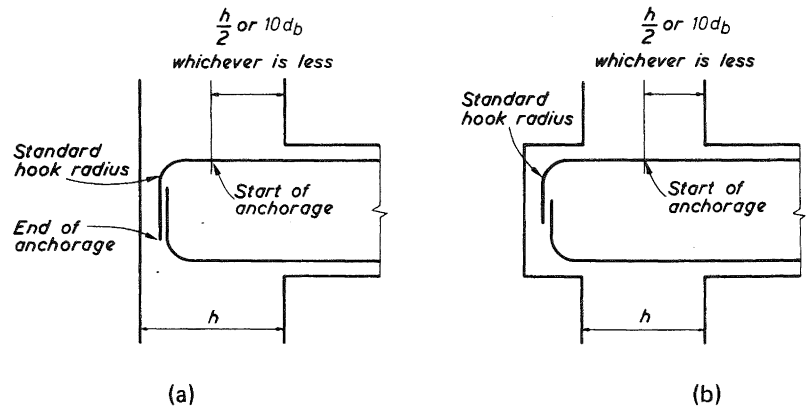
Anchorage of Beam Bars at Exterior Column When Plastic Hinge Can Form in Beam at Column Face: (a) Anchorage in Column, (b) Anchorage in Beam Stub
